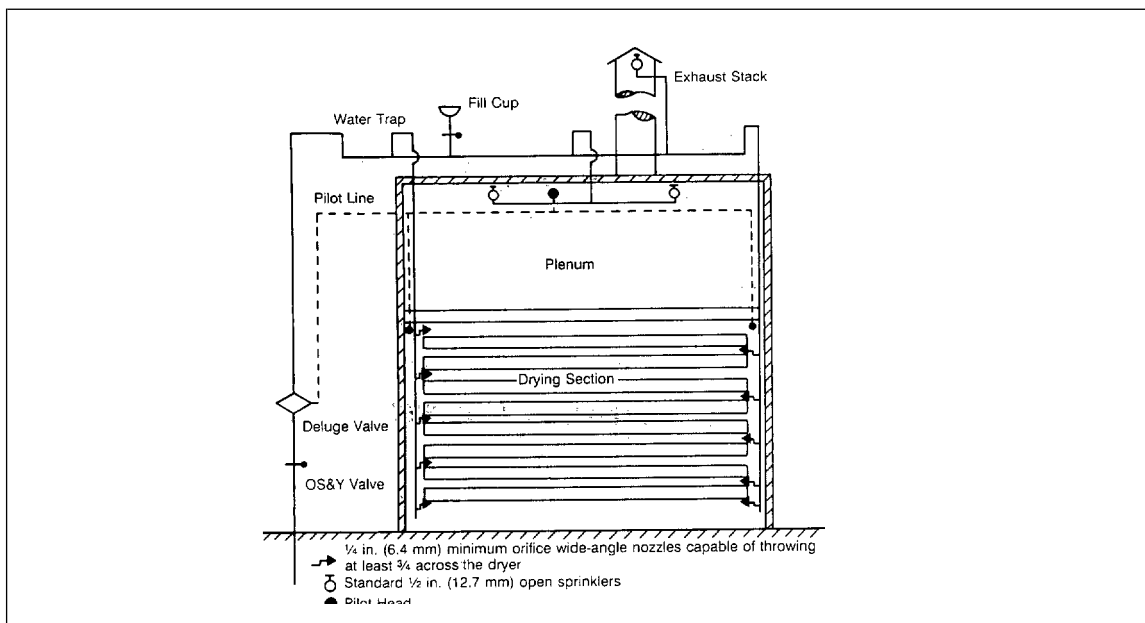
Typical arrangement of deluge protection for standard veneer dryer. (Section A-A of Fig. 1.)
